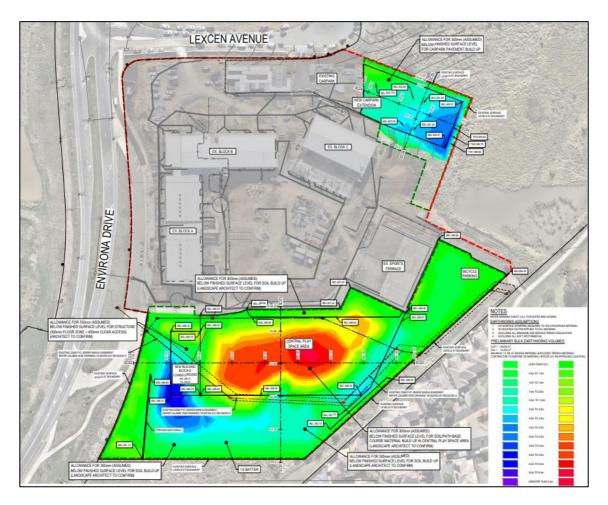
BULK EARTHWORKS LAYOUT PLAN
